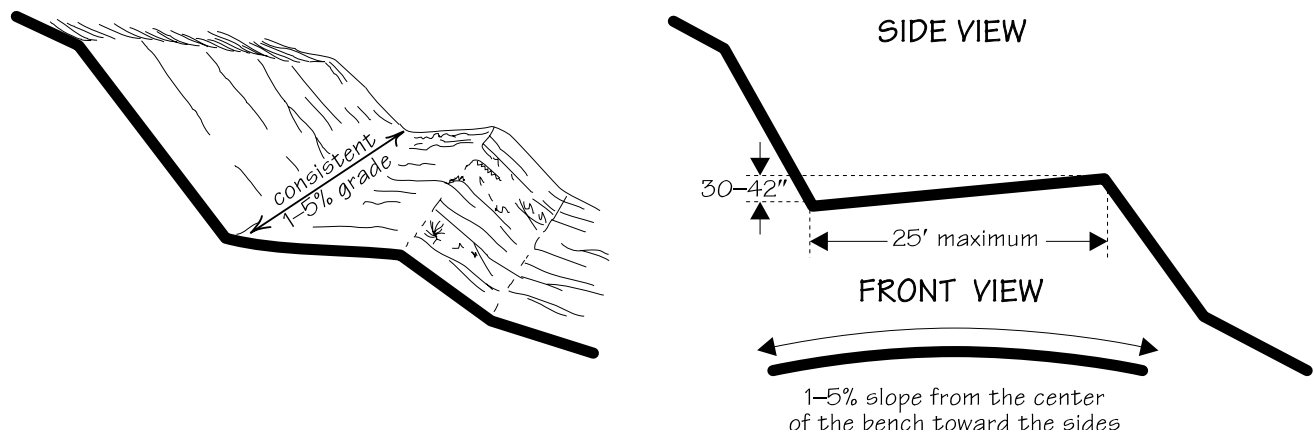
Benching and terracing of unconsolidated material to control runoff. Benches cut in overburden or other material likely to erode should be sloped into the hillside (side view) and away from the center of the bench (1–5% slope or grade) to allow drainage to either side (front view). (Modified from Law, 1984. Copyright © 1984 by Van Nostrand Reinhold Company Inc. Used by permission of the publisher.)
